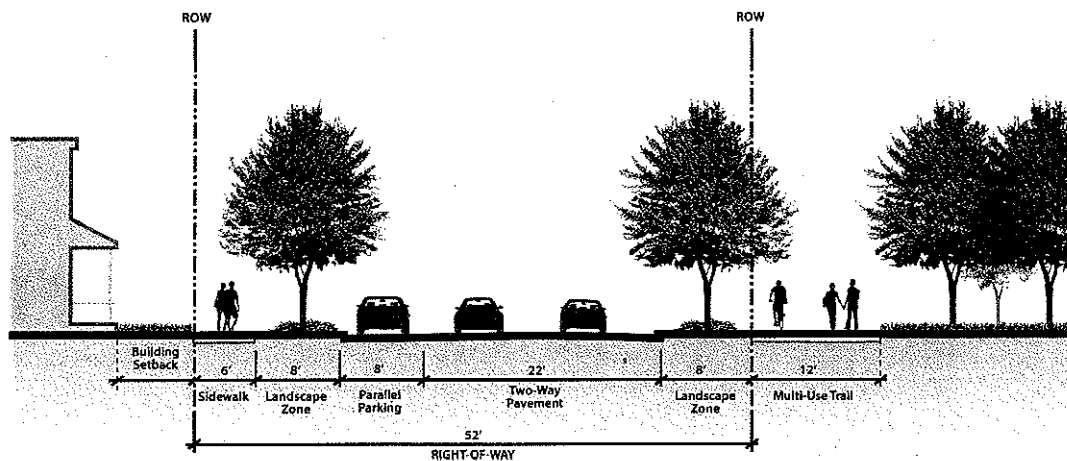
(1). Loop Road with Multi-Use Trail Cross Section
